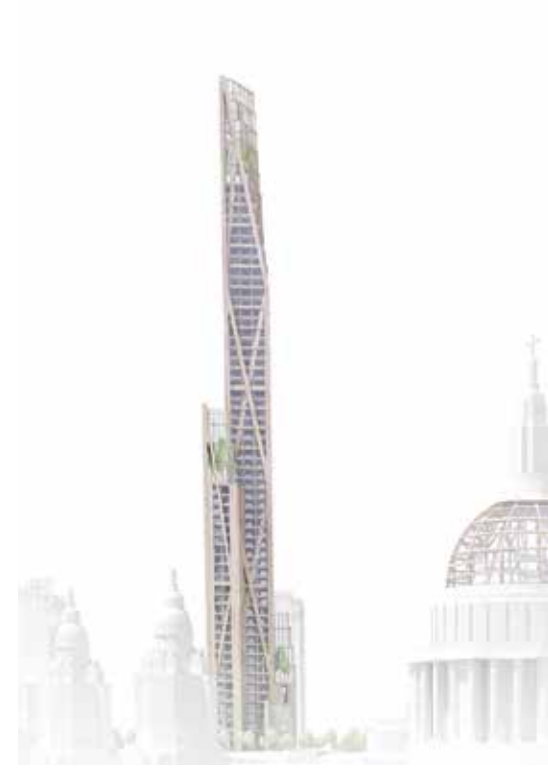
Oakwood Tower, London, PLP Architecture and Cambridge University's 80-story proposal. © PLP Architecture
